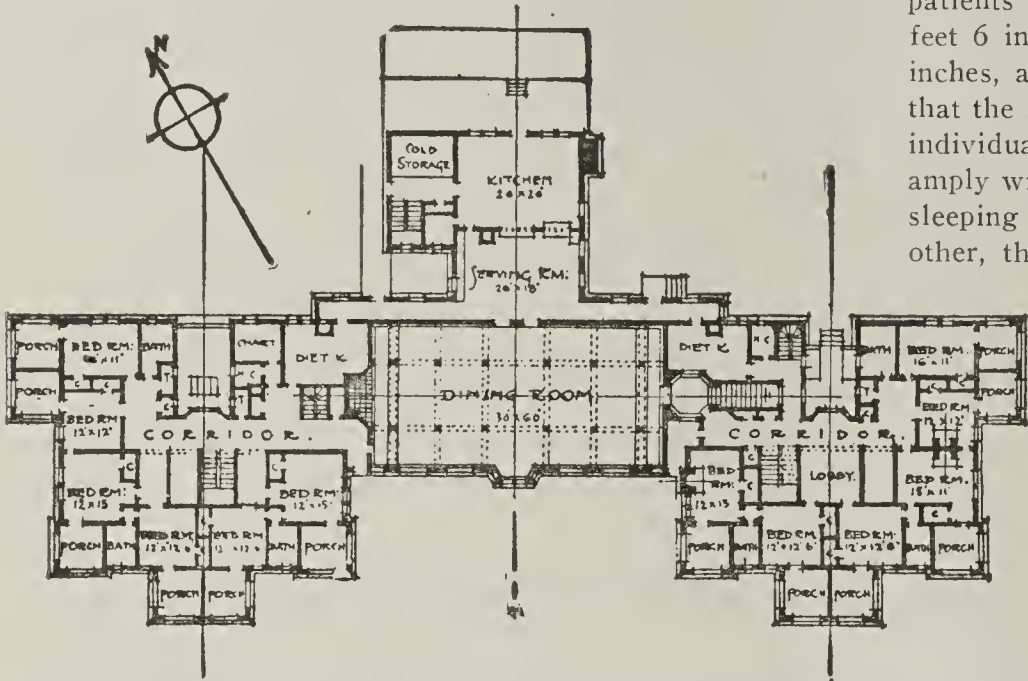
Plan of principal floor, main building; patients' suites grouped around dining room, office, kitchen, service room and storage. Each suite consists of bedroom, closet, sleeping porch and bathroom.
